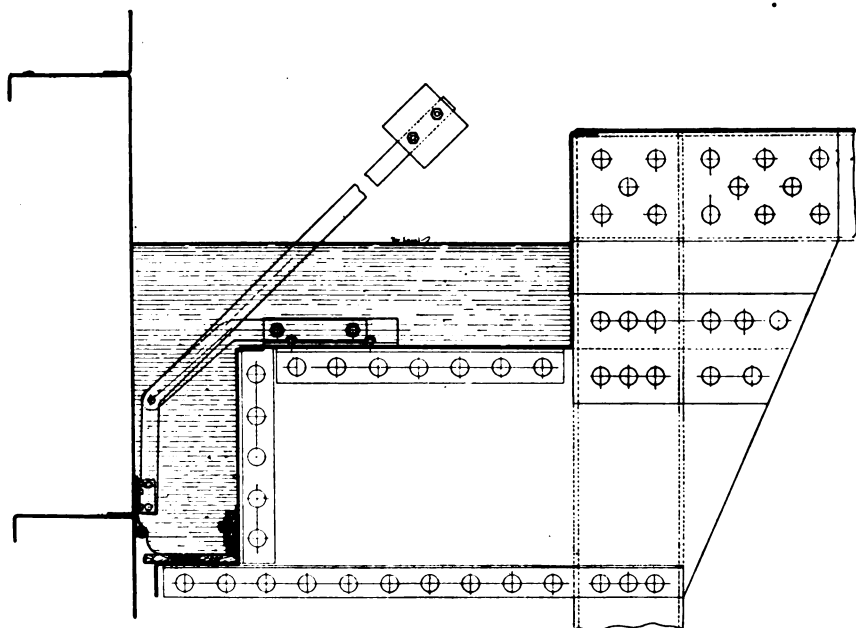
DETAIL OF TAR SEAL BETWEEN PISTON AND SIDES OF HOLDER.
